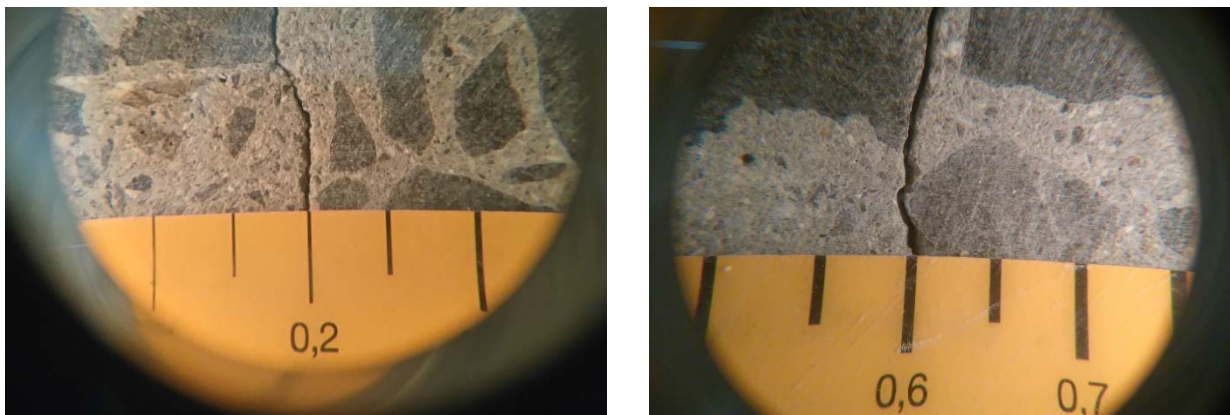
Induction of cracks on reinforced concrete beams
